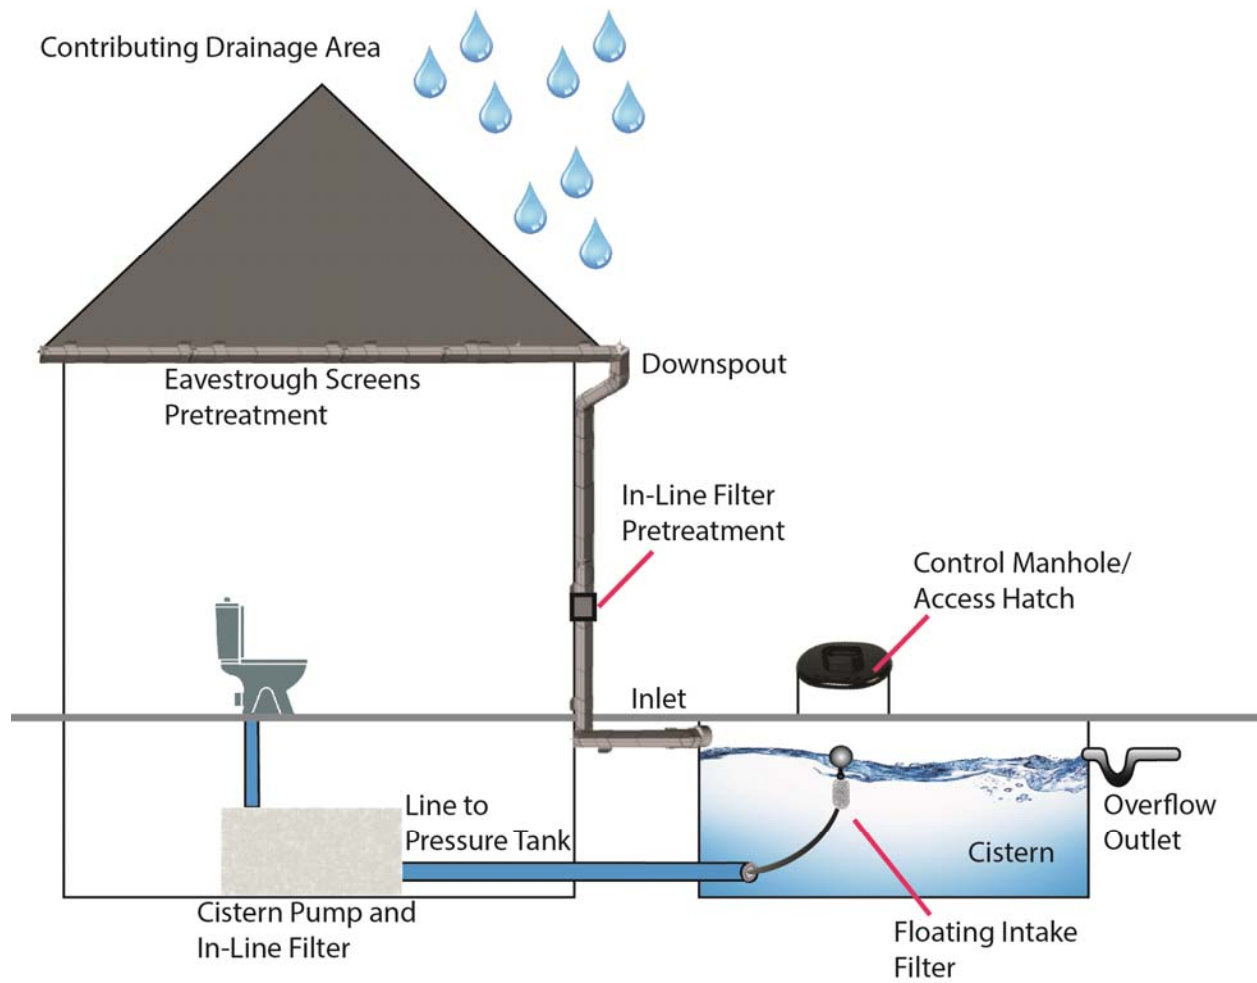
Generalized plan and cross-section views of a rainwater cistern showing key components.
